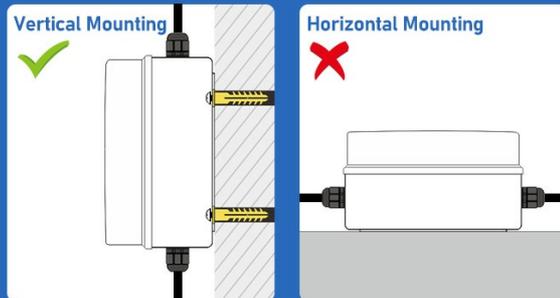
Illustration emphasizing vertical mounting for outdoor use to prevent water ingress, contrasting with incorrect horizontal mounting.
